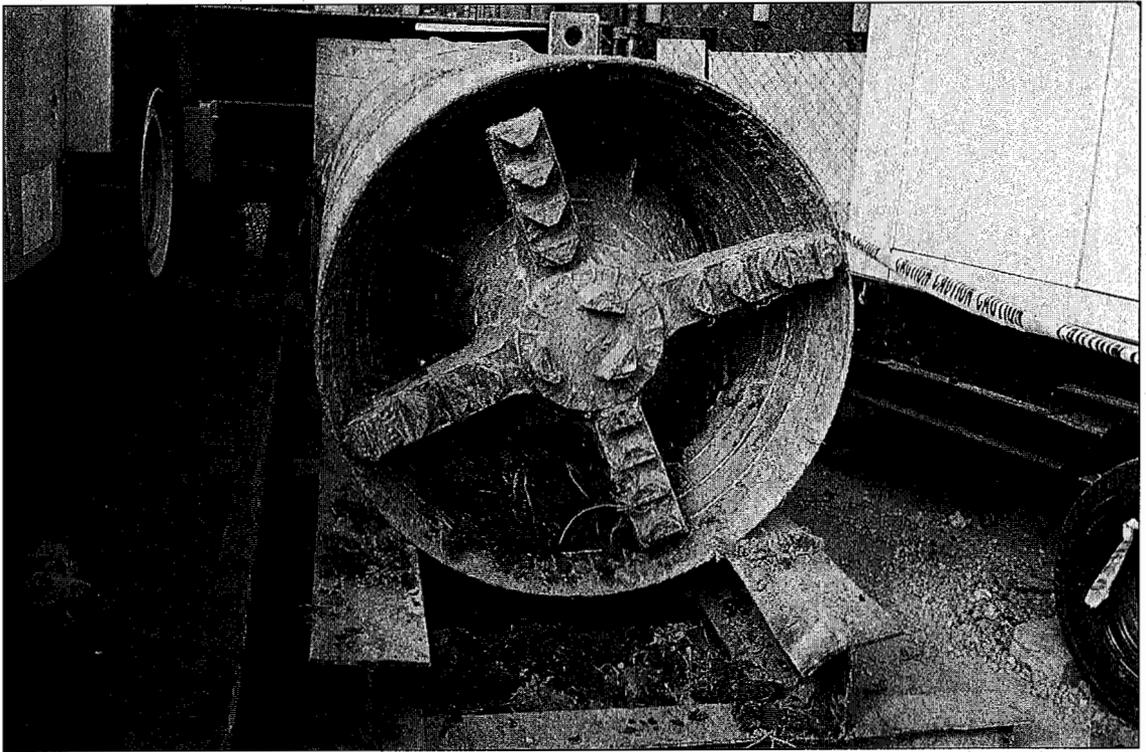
The tunnel boring machine used to install the 1.2-meter (48-inch) combined sewer.
